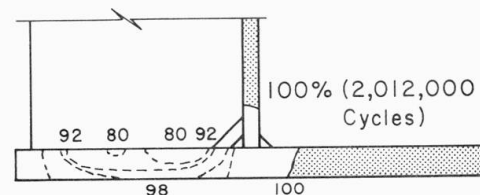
Stages of Crack Growth at Stiffener-to-Flange Connection.
